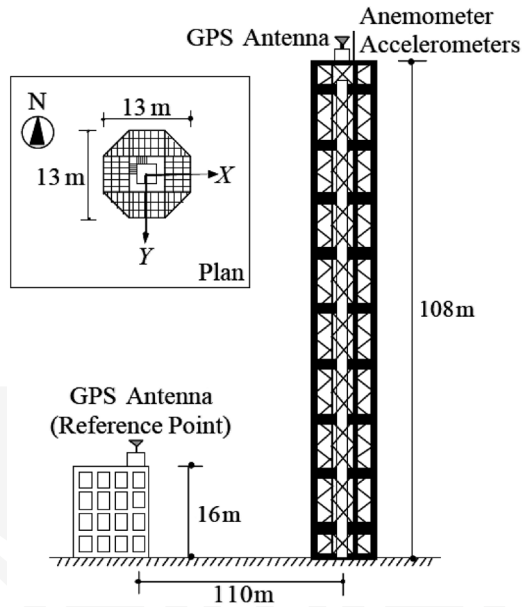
A 108 m tall steel tower for full-scale measurements [18]
